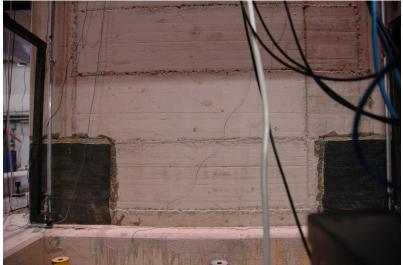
Position 1S: Hairline cracks develop in the wall
